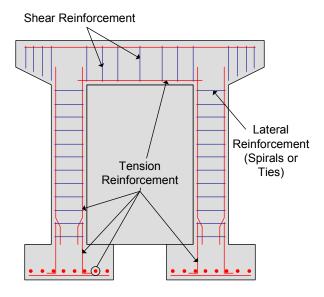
Primary Reinforcing Steel in Column Pier with Web
